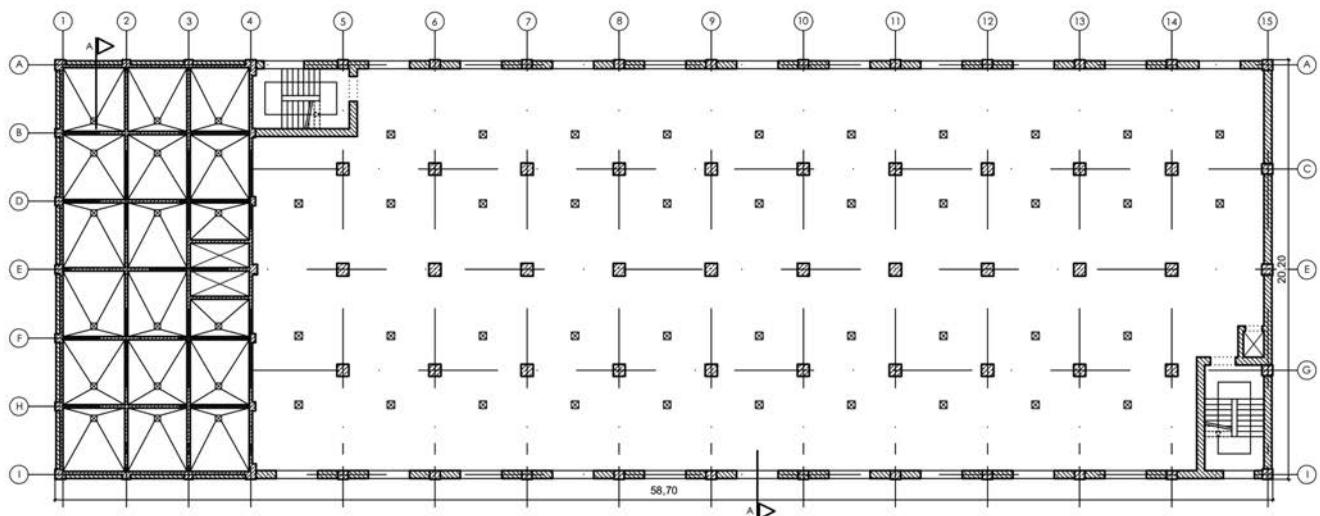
The groundfloor plan of Viktoria Warehouse of the 3rd floor, also indicating section A-A (CAD drawing by M. Kubiczek).
